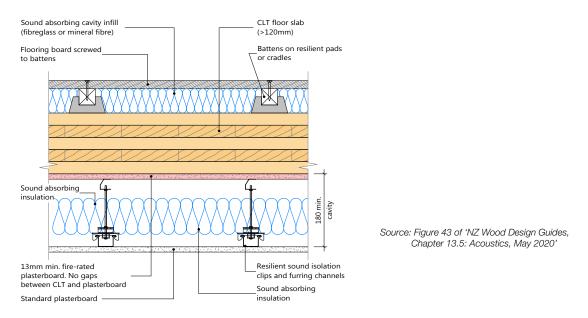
Mass timber floor with a generic lightweight floating floor system - Option 1
